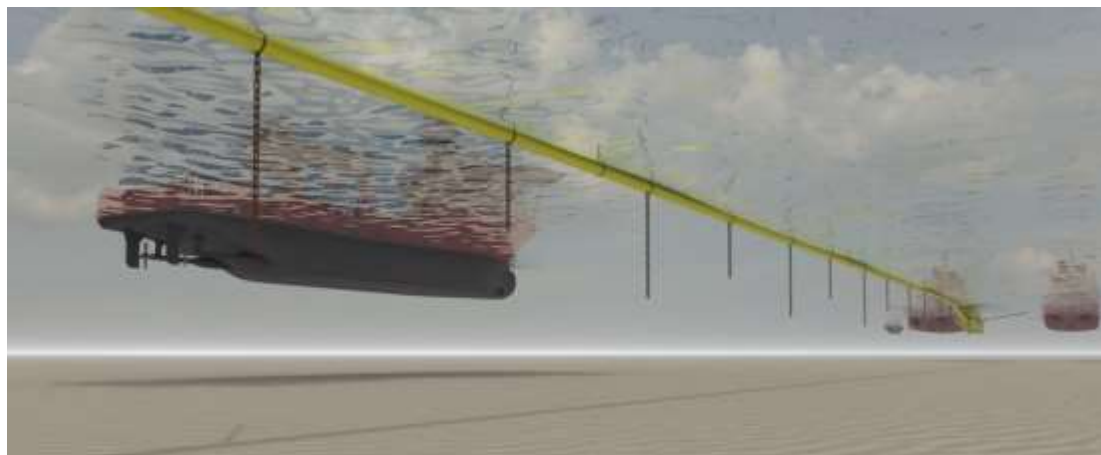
Bundle Tow Arrangement – Surface Tow
